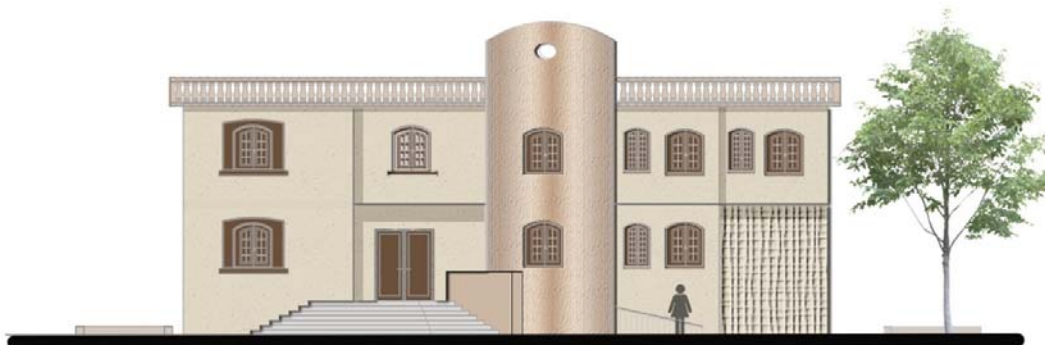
South-facing façade of the villa before redesigning (original interface with brick wall design).
